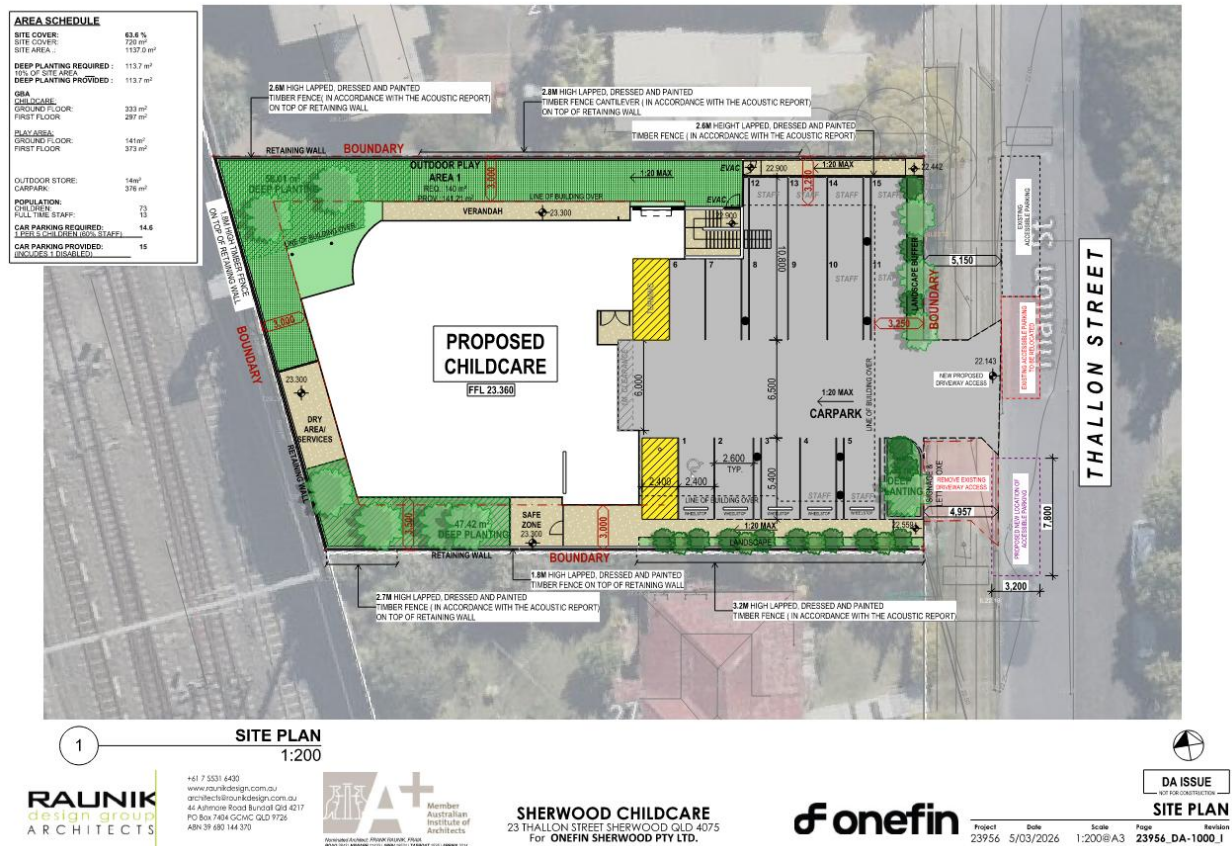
Site Plan (Raunik Design Group Architects)
